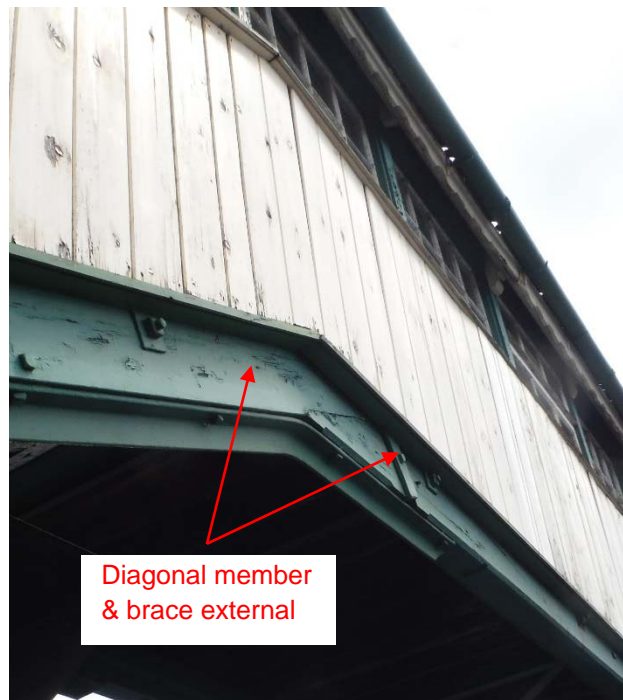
View from Platform 1 of external main span diagonal member which continues under the stairs up between the internal panels and external cladding. A metal brace appears to pass above this diagonal member, as shown in Figure 5 and Figure 10 and fix externally into the main horizontal member
